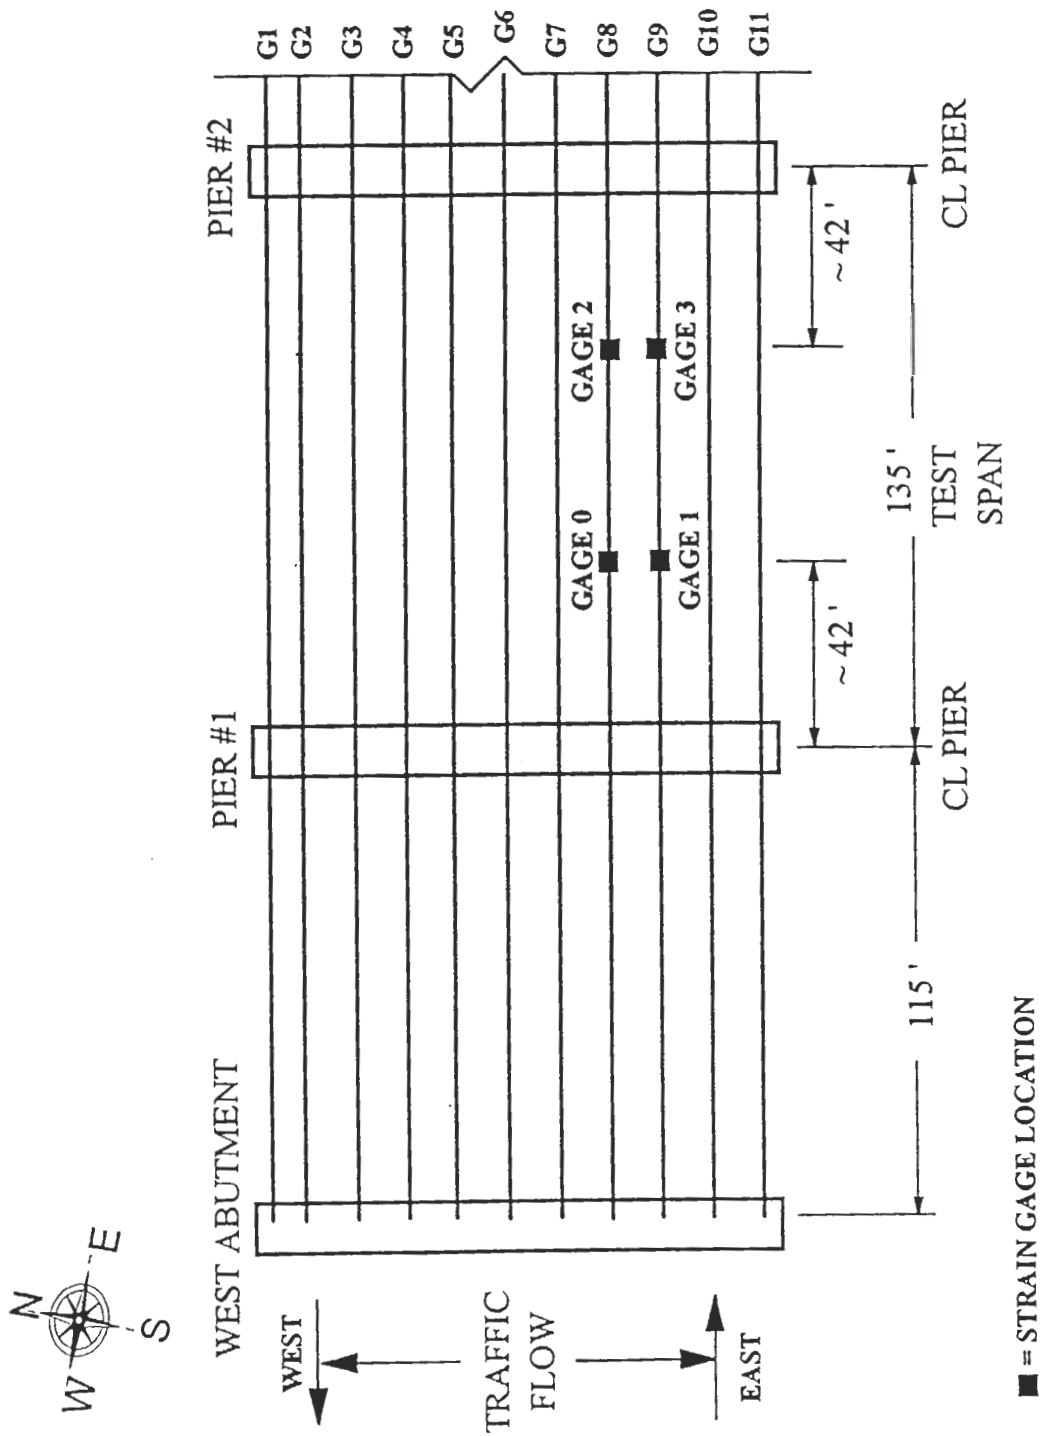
Yankee Doodle Bridge - Plan View Of Test Span With Strain Gage Locations
